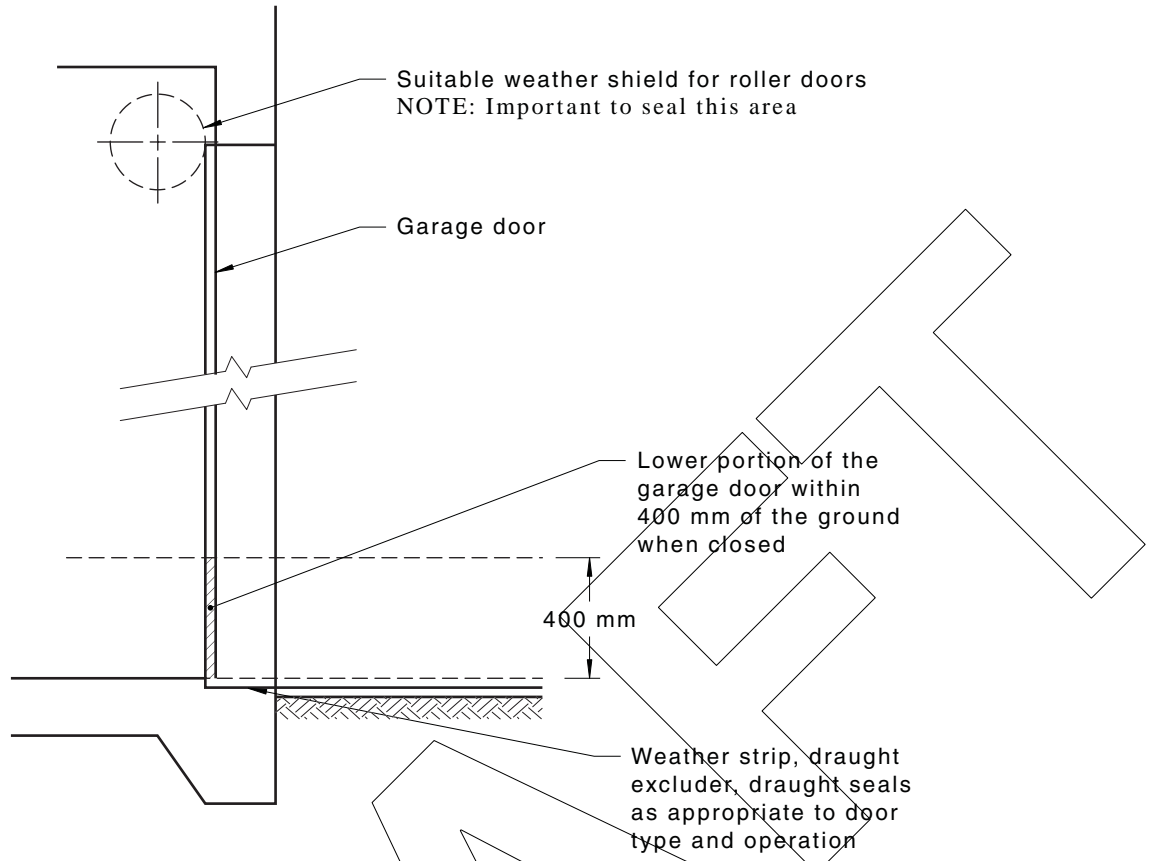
VEHICLE ACCESS DOORS (GARAGE DOORS)
